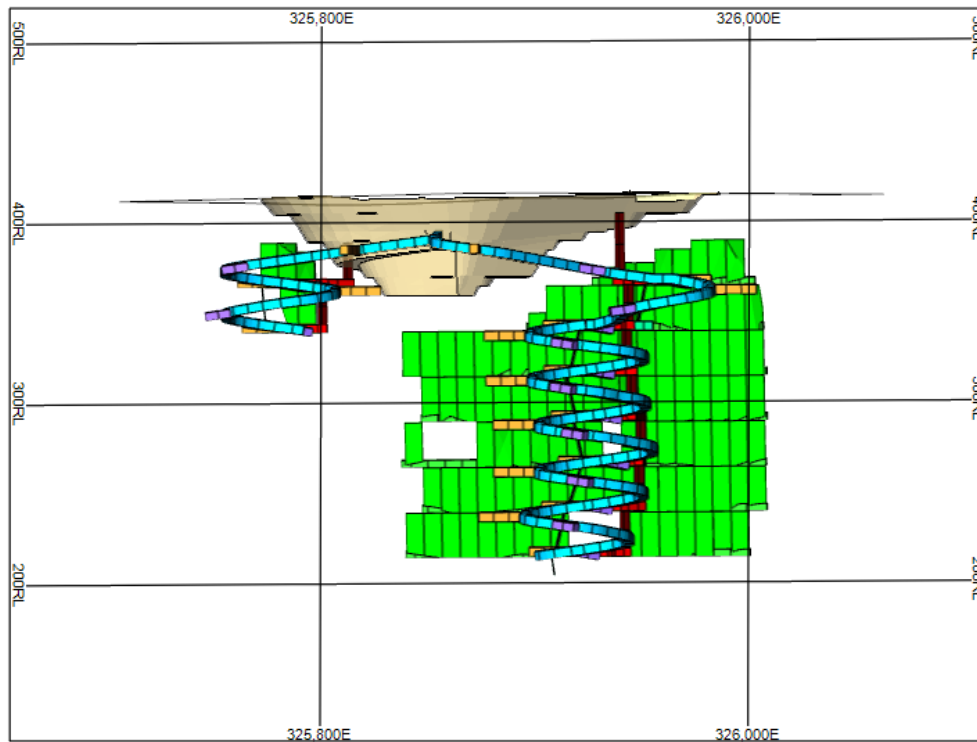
PFS Mine Design – Longitudinal view looking North – North-East
